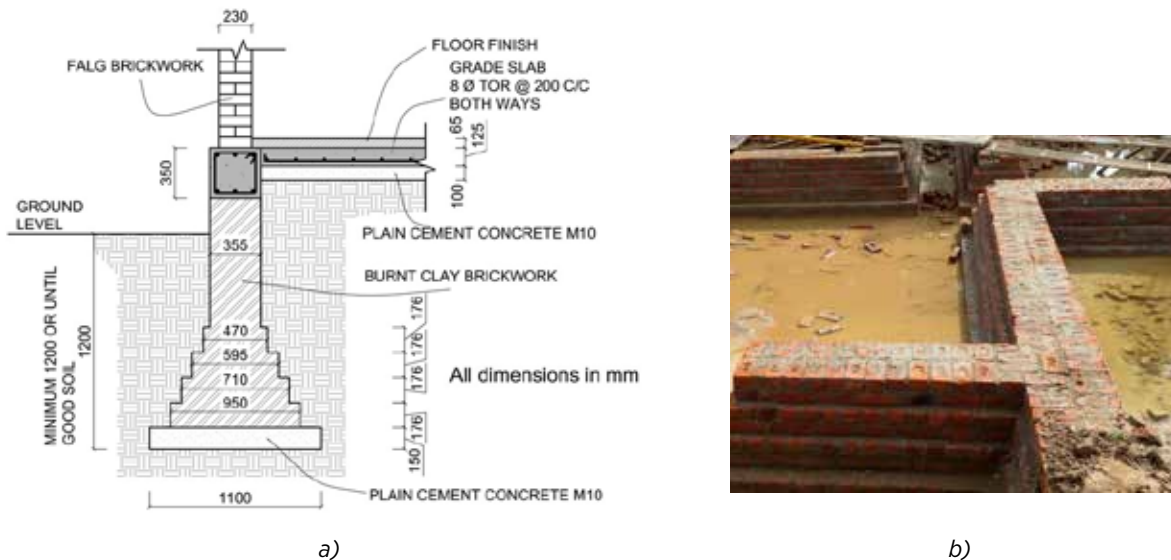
Brick masonry foundations: a) a vertical section, and b) foundation construction.
